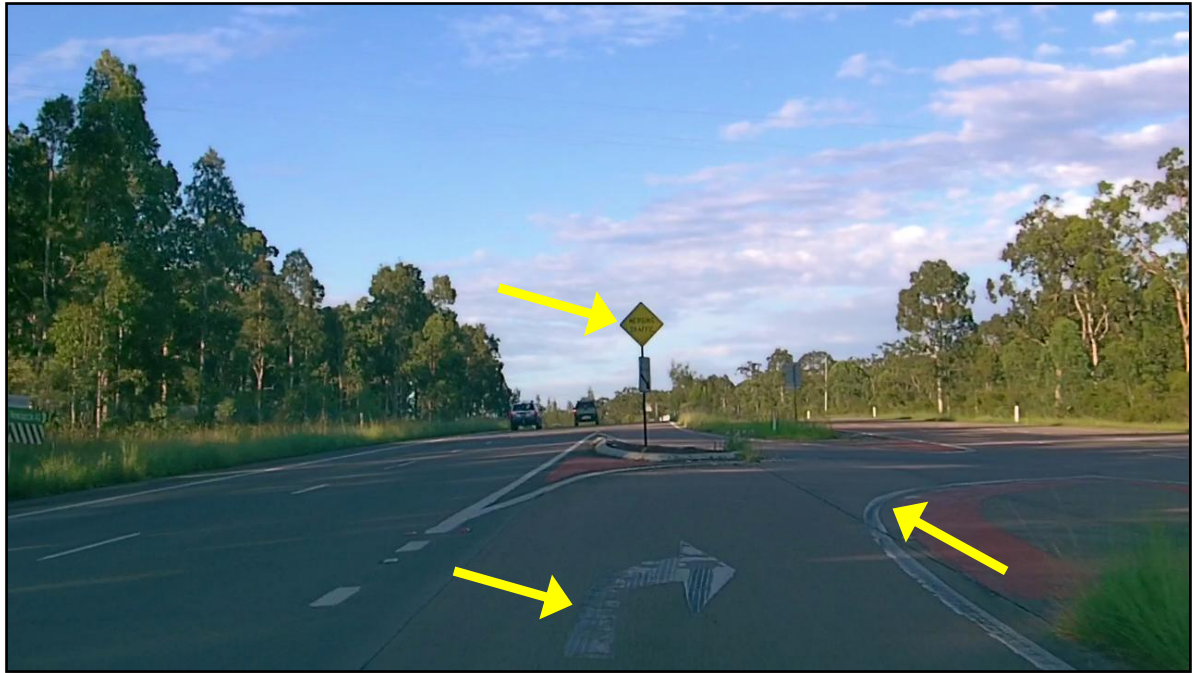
For southbound highway traffic, a 'merging traffic' sign is located at the Italia Road intersection 'seagull' splitter island for the acceleration lane merge, which is approximately 1.2 km prior to the actual merge. Also, note the faded pavement markings (pavement turn arrows and edgeline) at the intersection.
